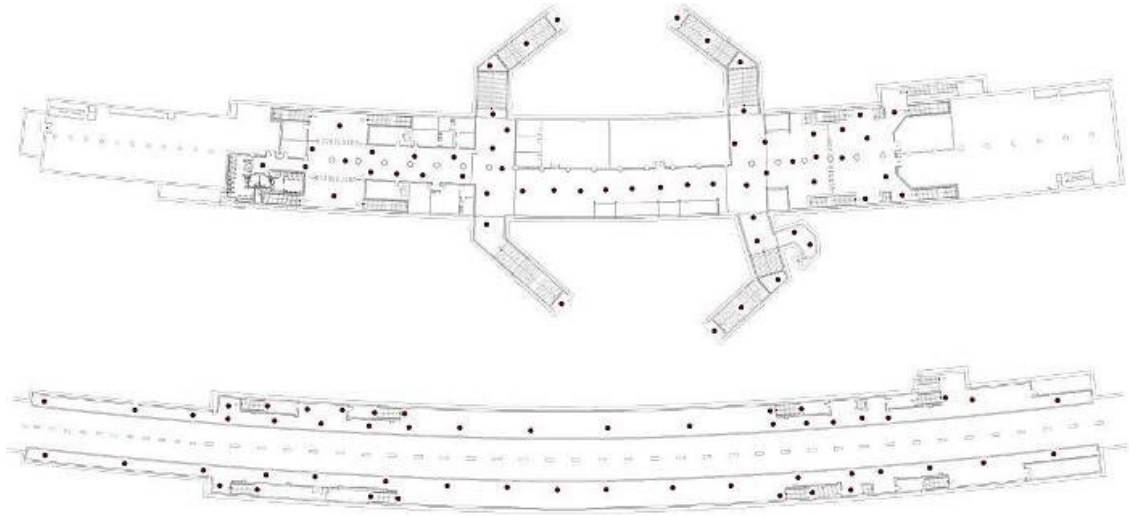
Floor plan of Bangbae metro-station and scan position.
